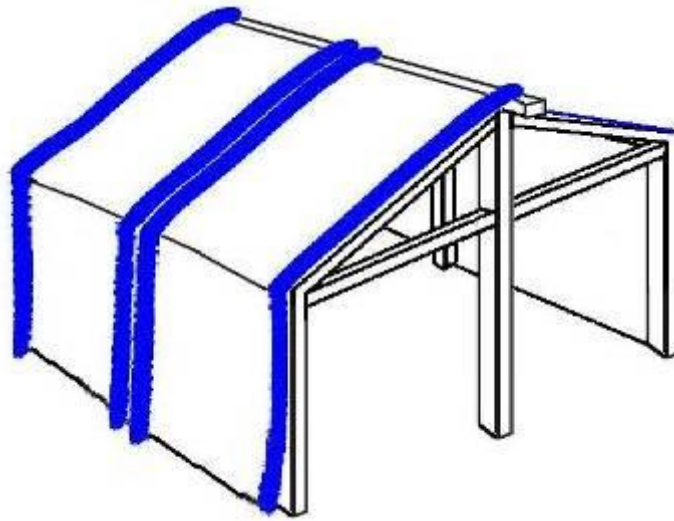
Phase 3 –Framed Structure - Tarpaulins used as walls and roof
